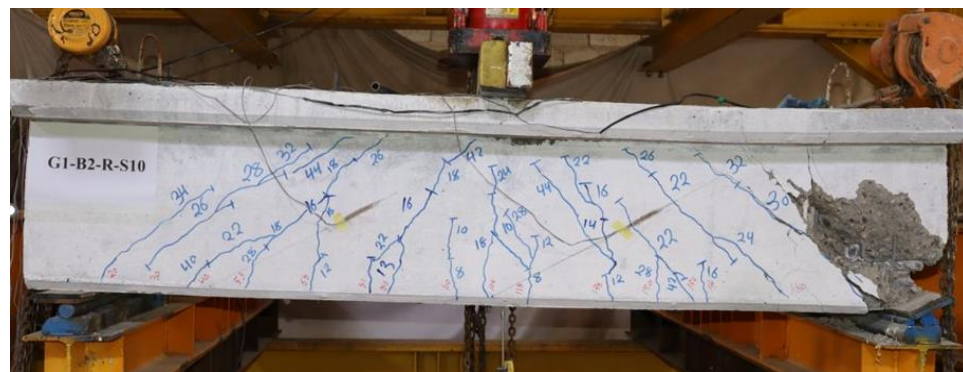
Failure crack pattern of specimen G1-B2-R-S10
